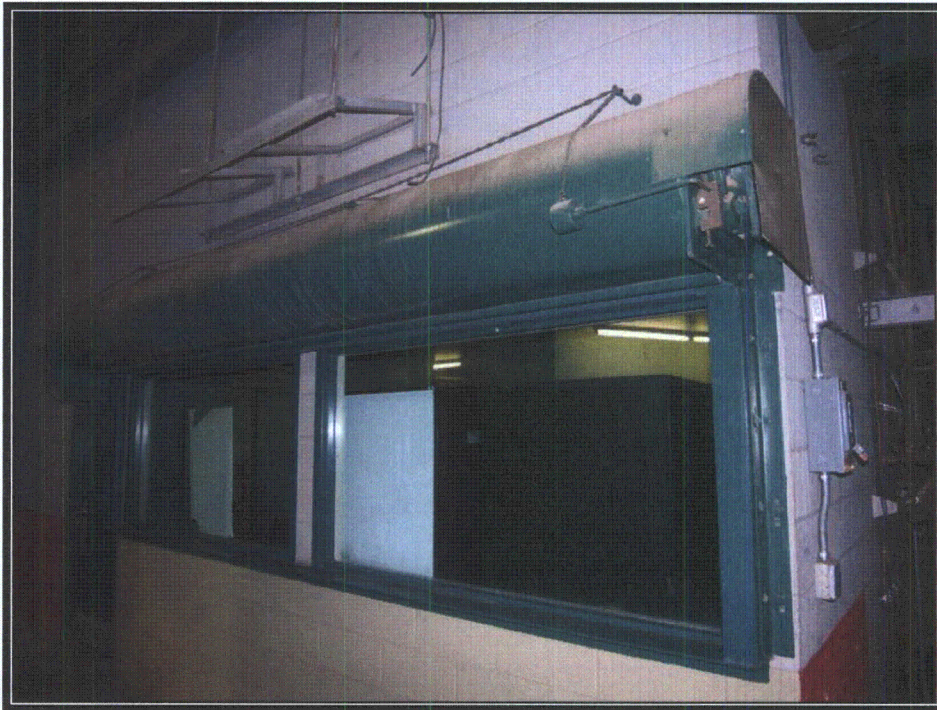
Steel roller curtain on control room window (Photograph by RCG&A, 2008)
